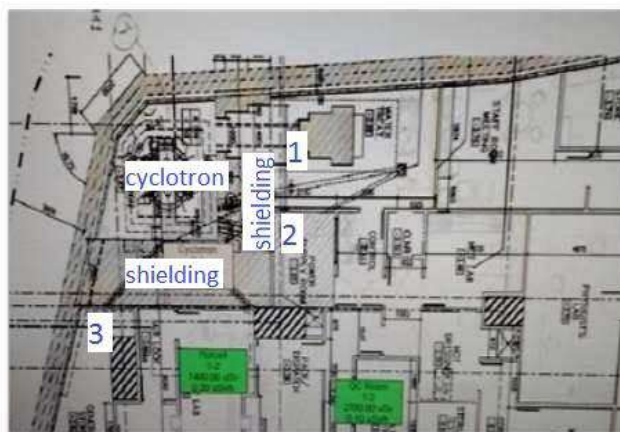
Points of gamma measurement are bunker entry wall (1), power supply wall (2), and general store wall (3).
